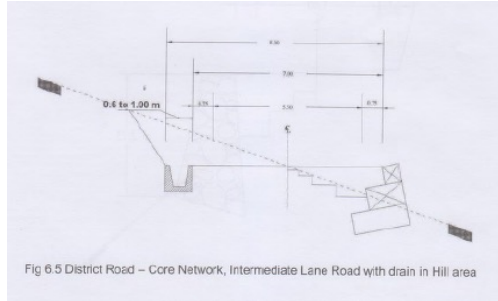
District Road – Core Network, Intermediate Lane Road with drain in Hill area
